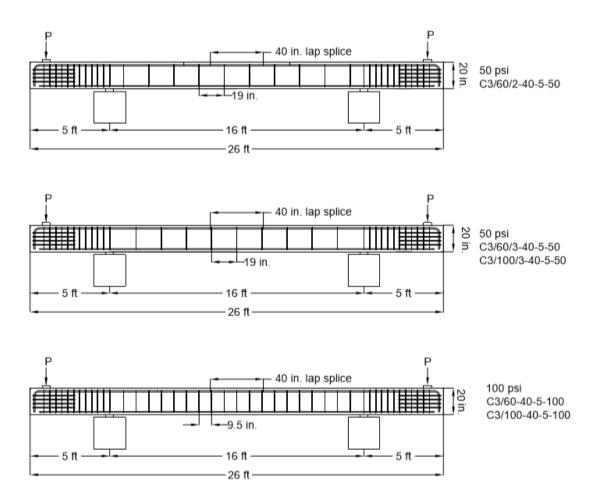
Elevations of $40d_b$ Confined Specimens
